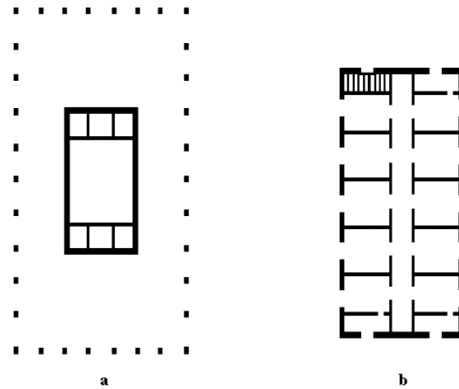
Type plane of (A) High-rise office building and (B) High-rise building of dormitory [5]
